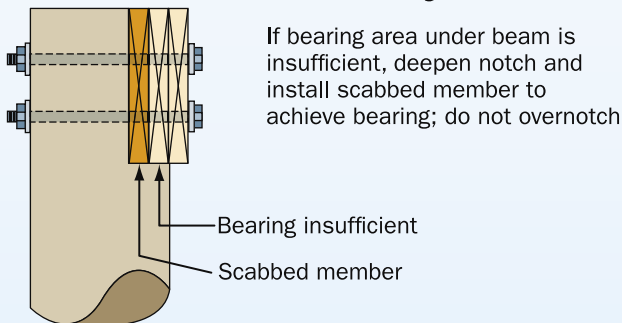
Standard connection with pile notched on opposite side to avoid overnotching
